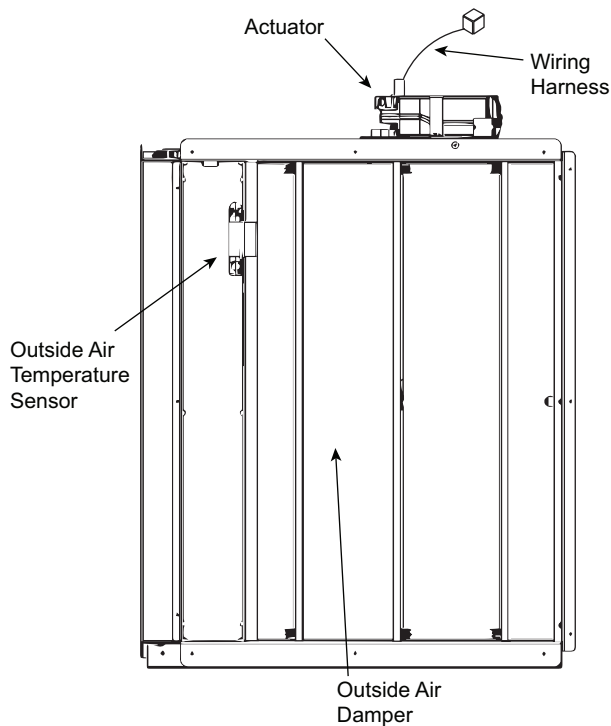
EconomizerONE Component Locations (CRECOMZR108A00 Shown)
